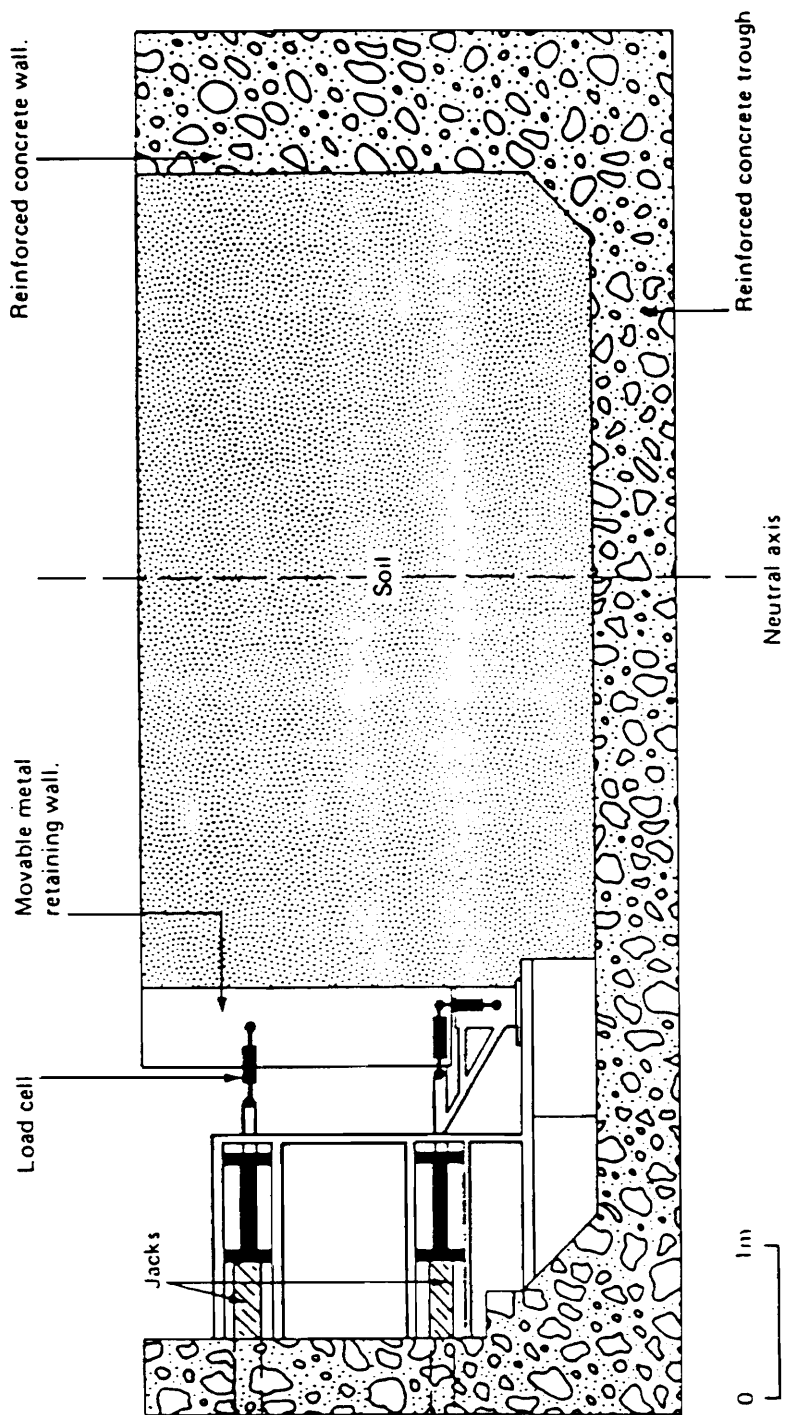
Experimental Retaining Wall Facility, Transport and Road Research Laboratory (Carder, et al., 1977).
